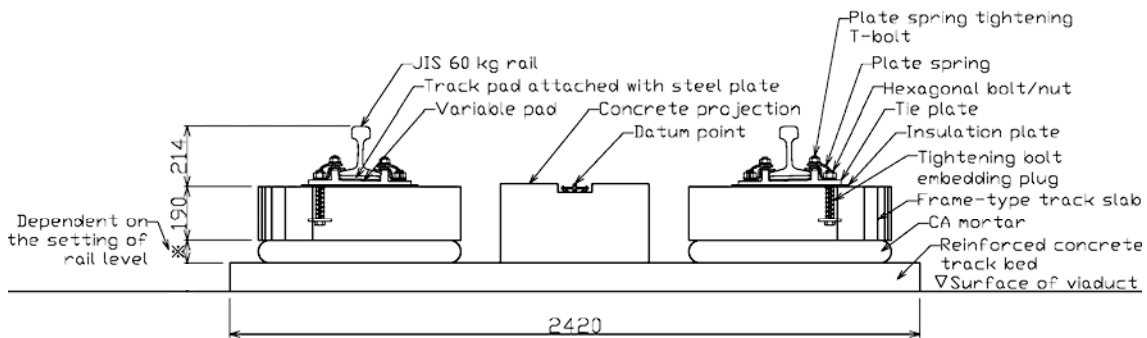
Standard Cross-section of the Tracks in Viaduct/Bridge Sections
